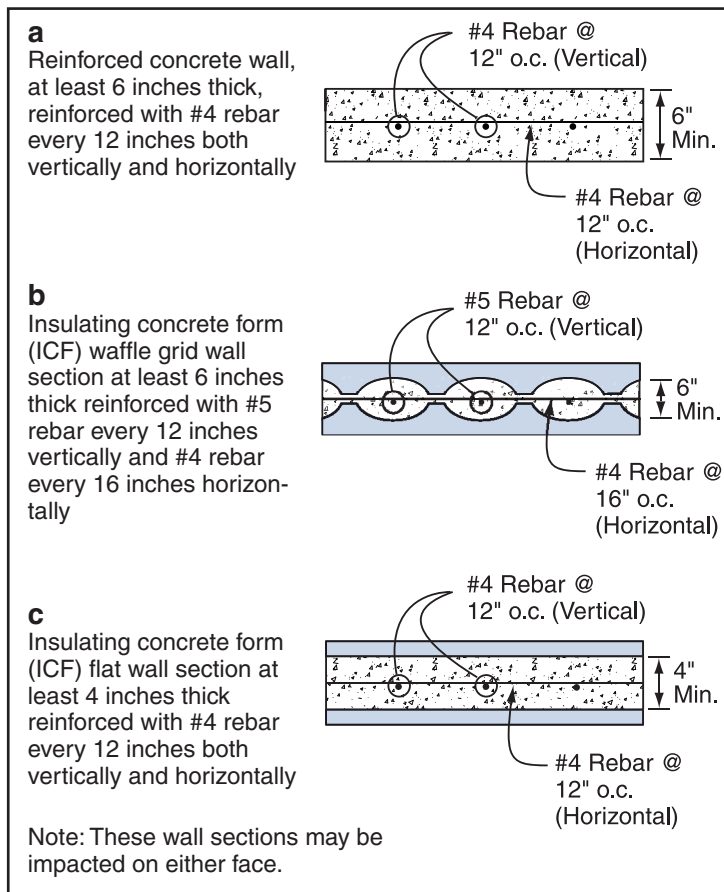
Reinforced concrete wall section (a), reinforced concrete “waffle” wall constructed with insulating concrete forms (b), and reinforced concrete “flat” wall constructed with insulating concrete forms (c)
